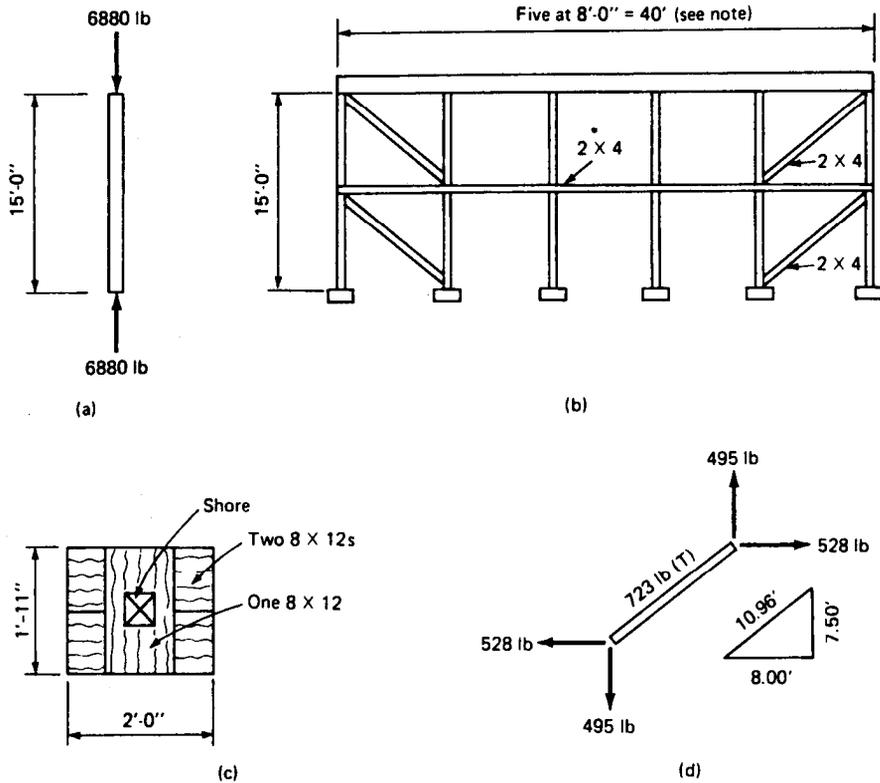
Shore design details. (a) Typical shore; (b) elevation. (Note: Braced bents at 4'-0" on center.) (c) Base for shore; (d) diagonal brace-forces and dimensions.
